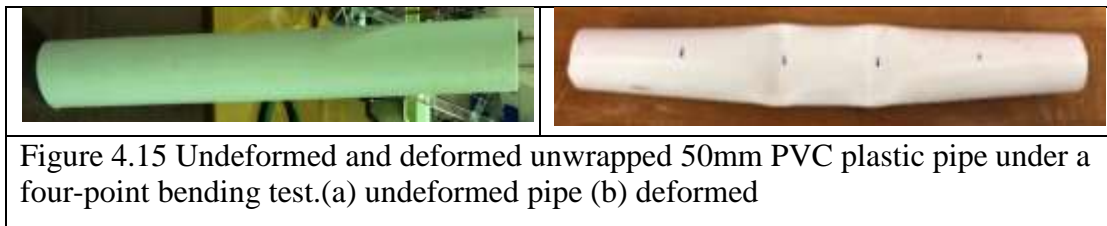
Undeformed and deformed unwrapped 50mm PVC plastic pipe under a four-point bending test.(a) undeformed pipe (b) deformed
